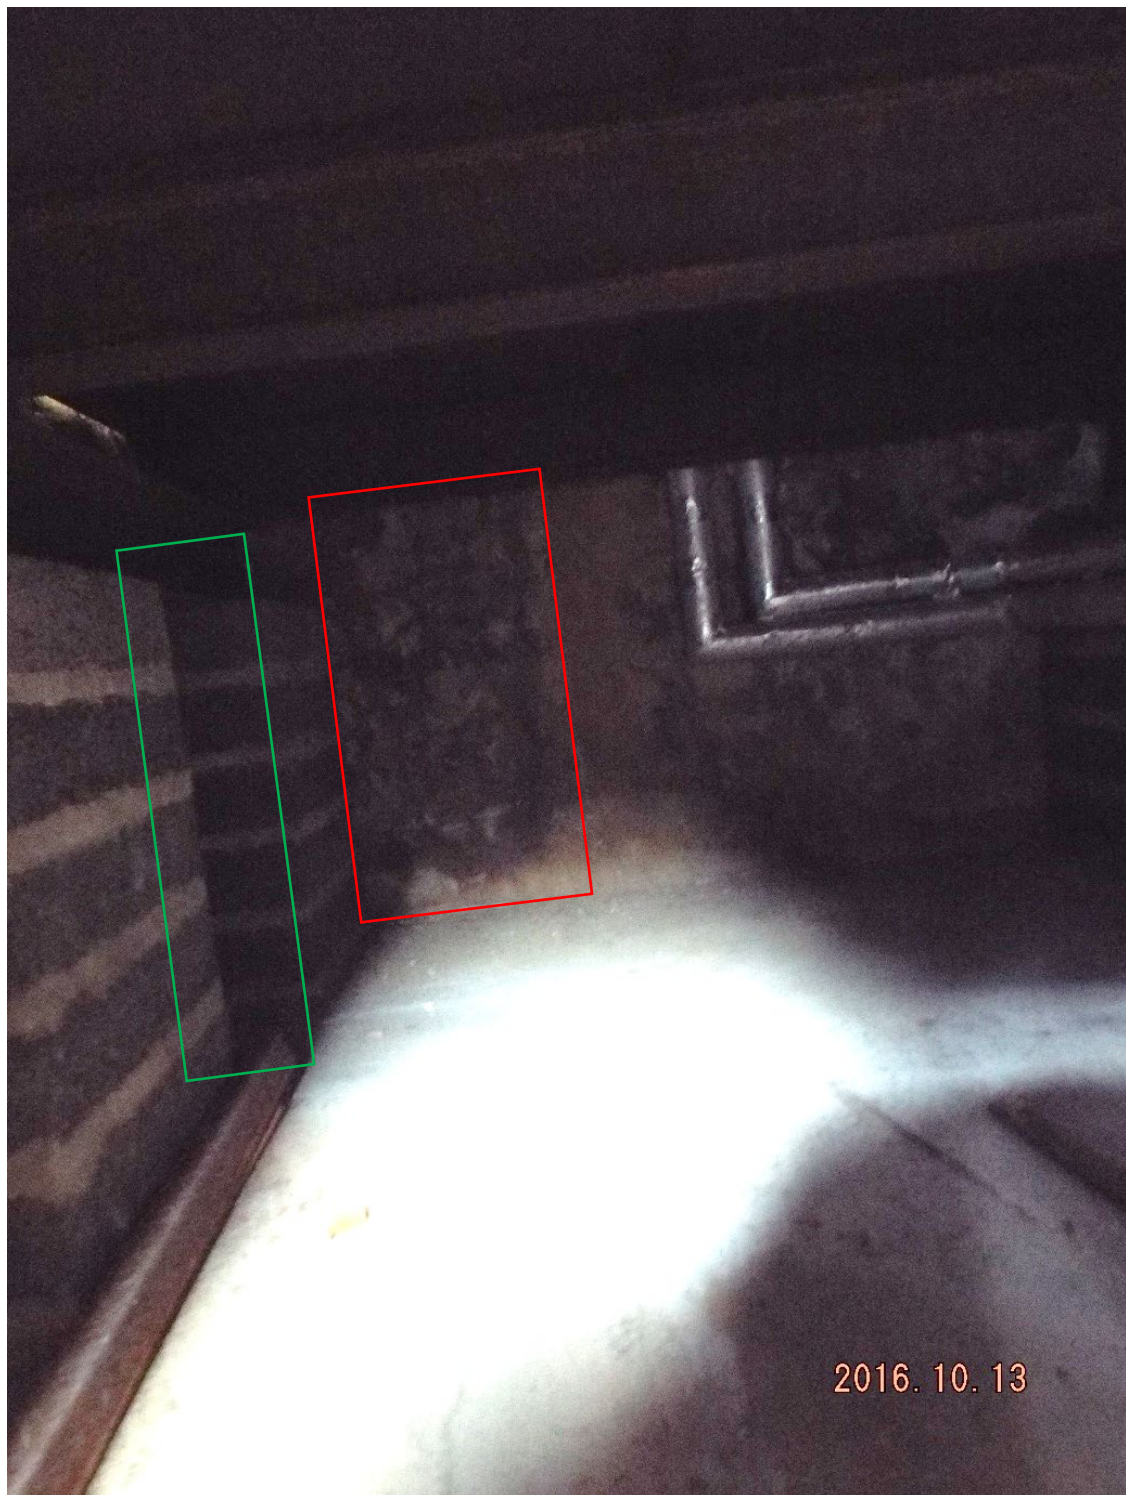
Original floor level showing blocked doorway (indicated in red), lower floor level also housed a well (however modern cement now covers original floor). Indication in green shows possible location of original staircase to upper-level (further investigation required).
